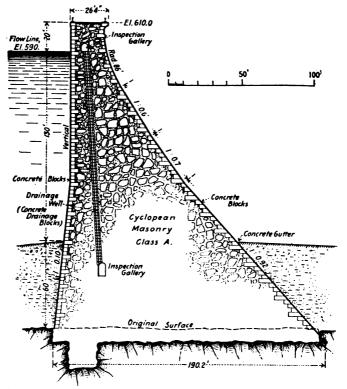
Section of Olive Bridge dam, New York; built 1908 to 1913; cyclopean masonry; concrete block faces; length 1,000 ft.; max. height 251 ft.; contains 488,200 cu. yd.
